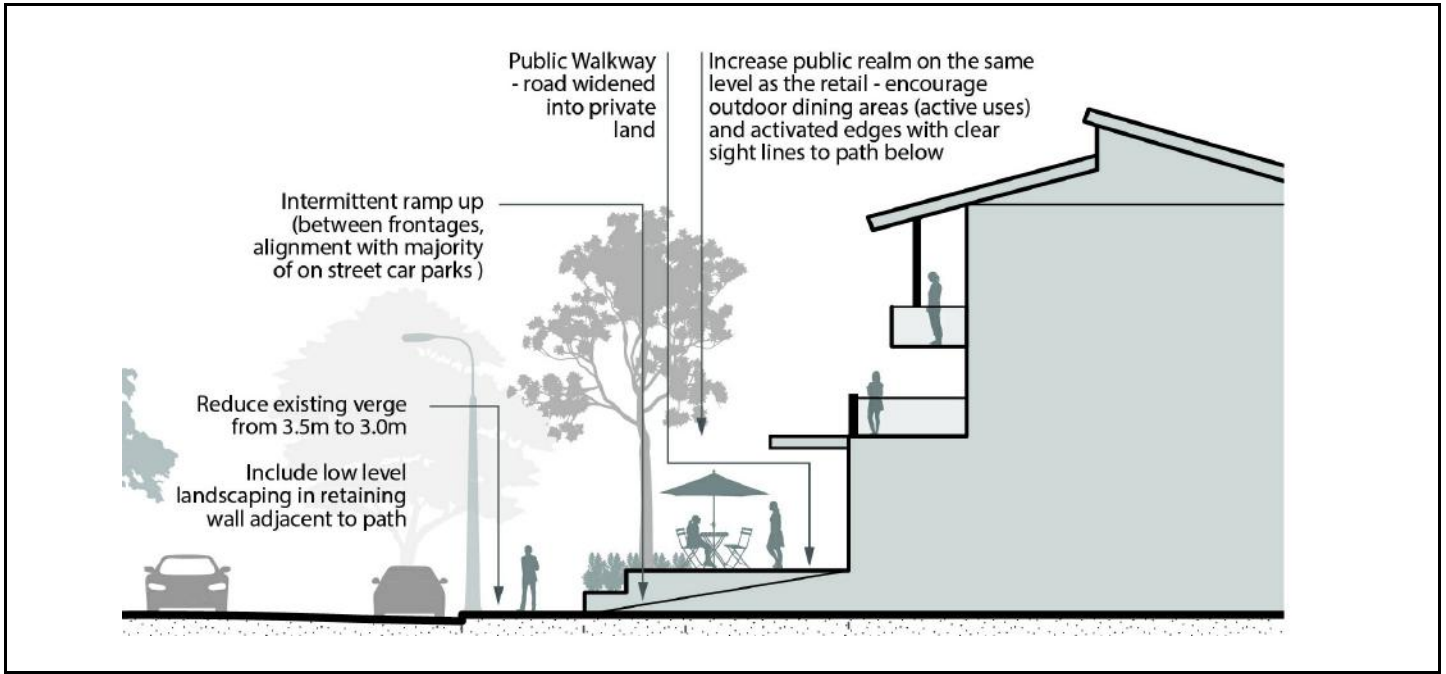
Gibson Gympie Road Terrace / Mary Street / Thomas Street
